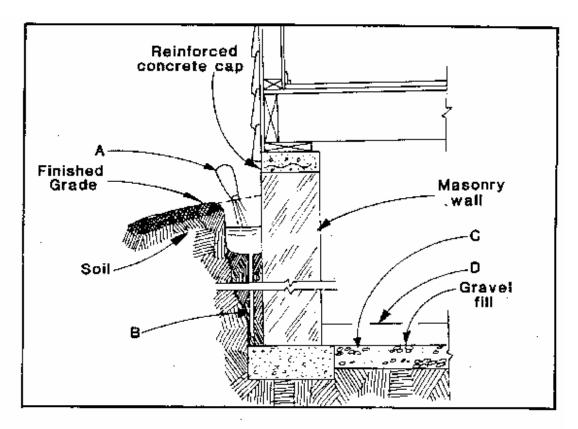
Chemical Application to Soil In and Around a House with a Full Basement. (A. treatment along outside of foundation; B. rodding from bottom oftrench to top of footing; C, treatment of fill or soil beneath a concrete floor in the basement; D, concrete slab poured after chemical is applied.)
